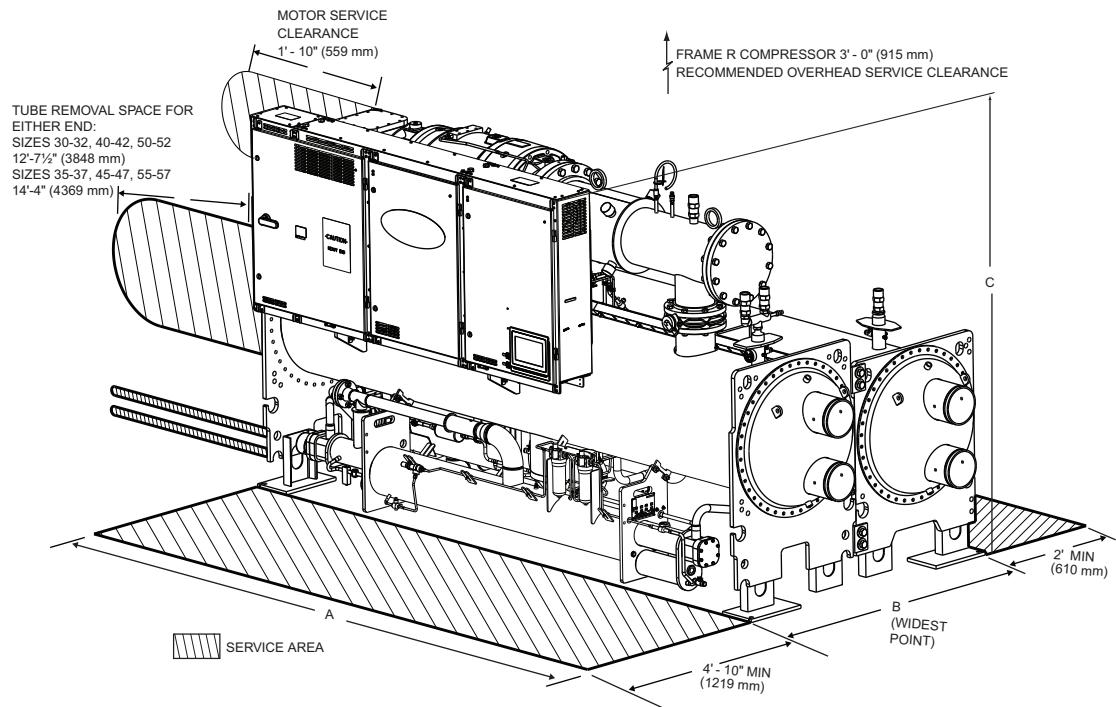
23XRV Heat Exchanger Sizes 30-57 Dimensions (Unit with R Compressor Shown)
